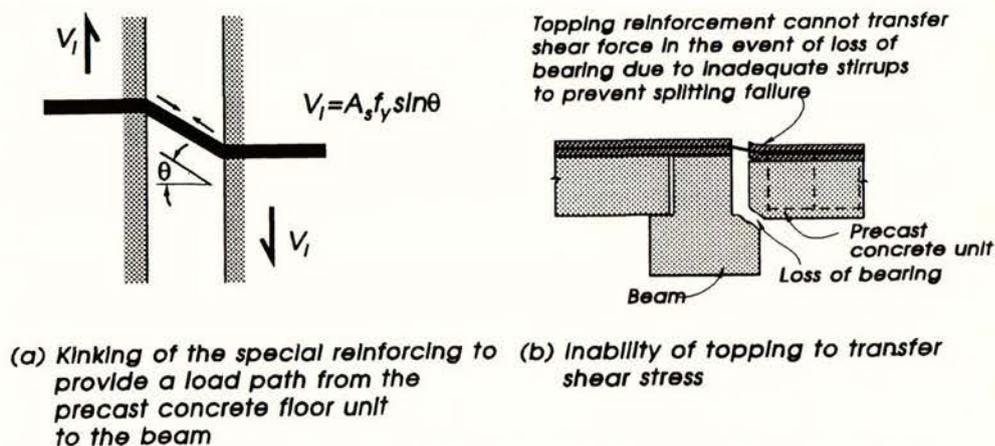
Kinking of Reinforcement and Possible Failure of Topping if Bearing of Precast Unit is Lost According to the New Zealand Guidelines [1]
